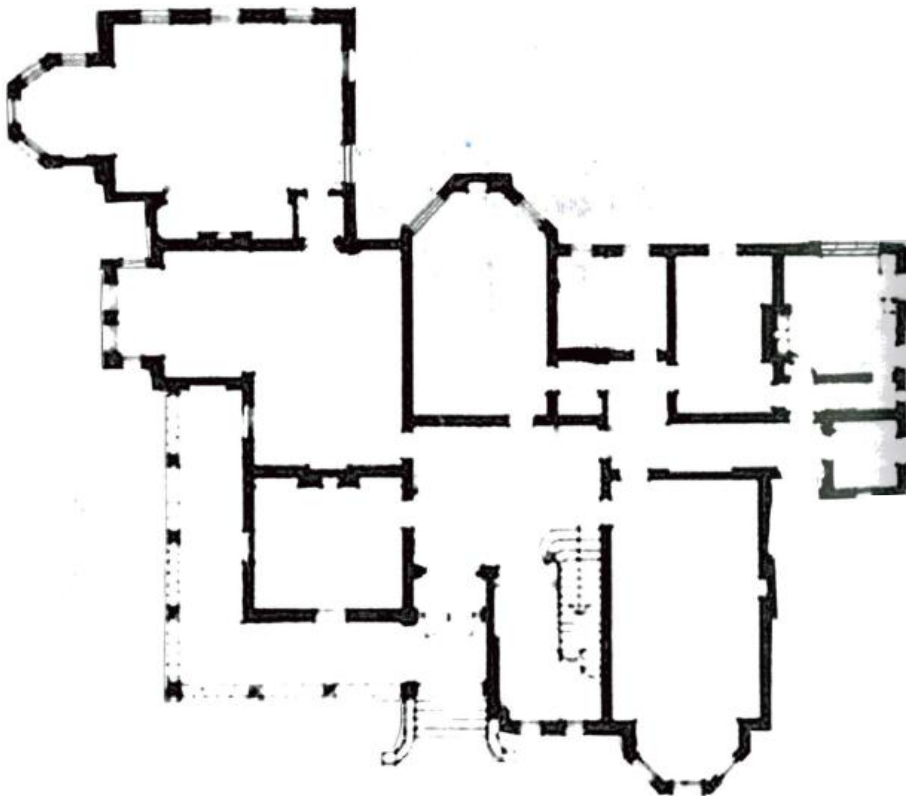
The ground floor plan showing Kemp's addition added to the north-west of the main building
